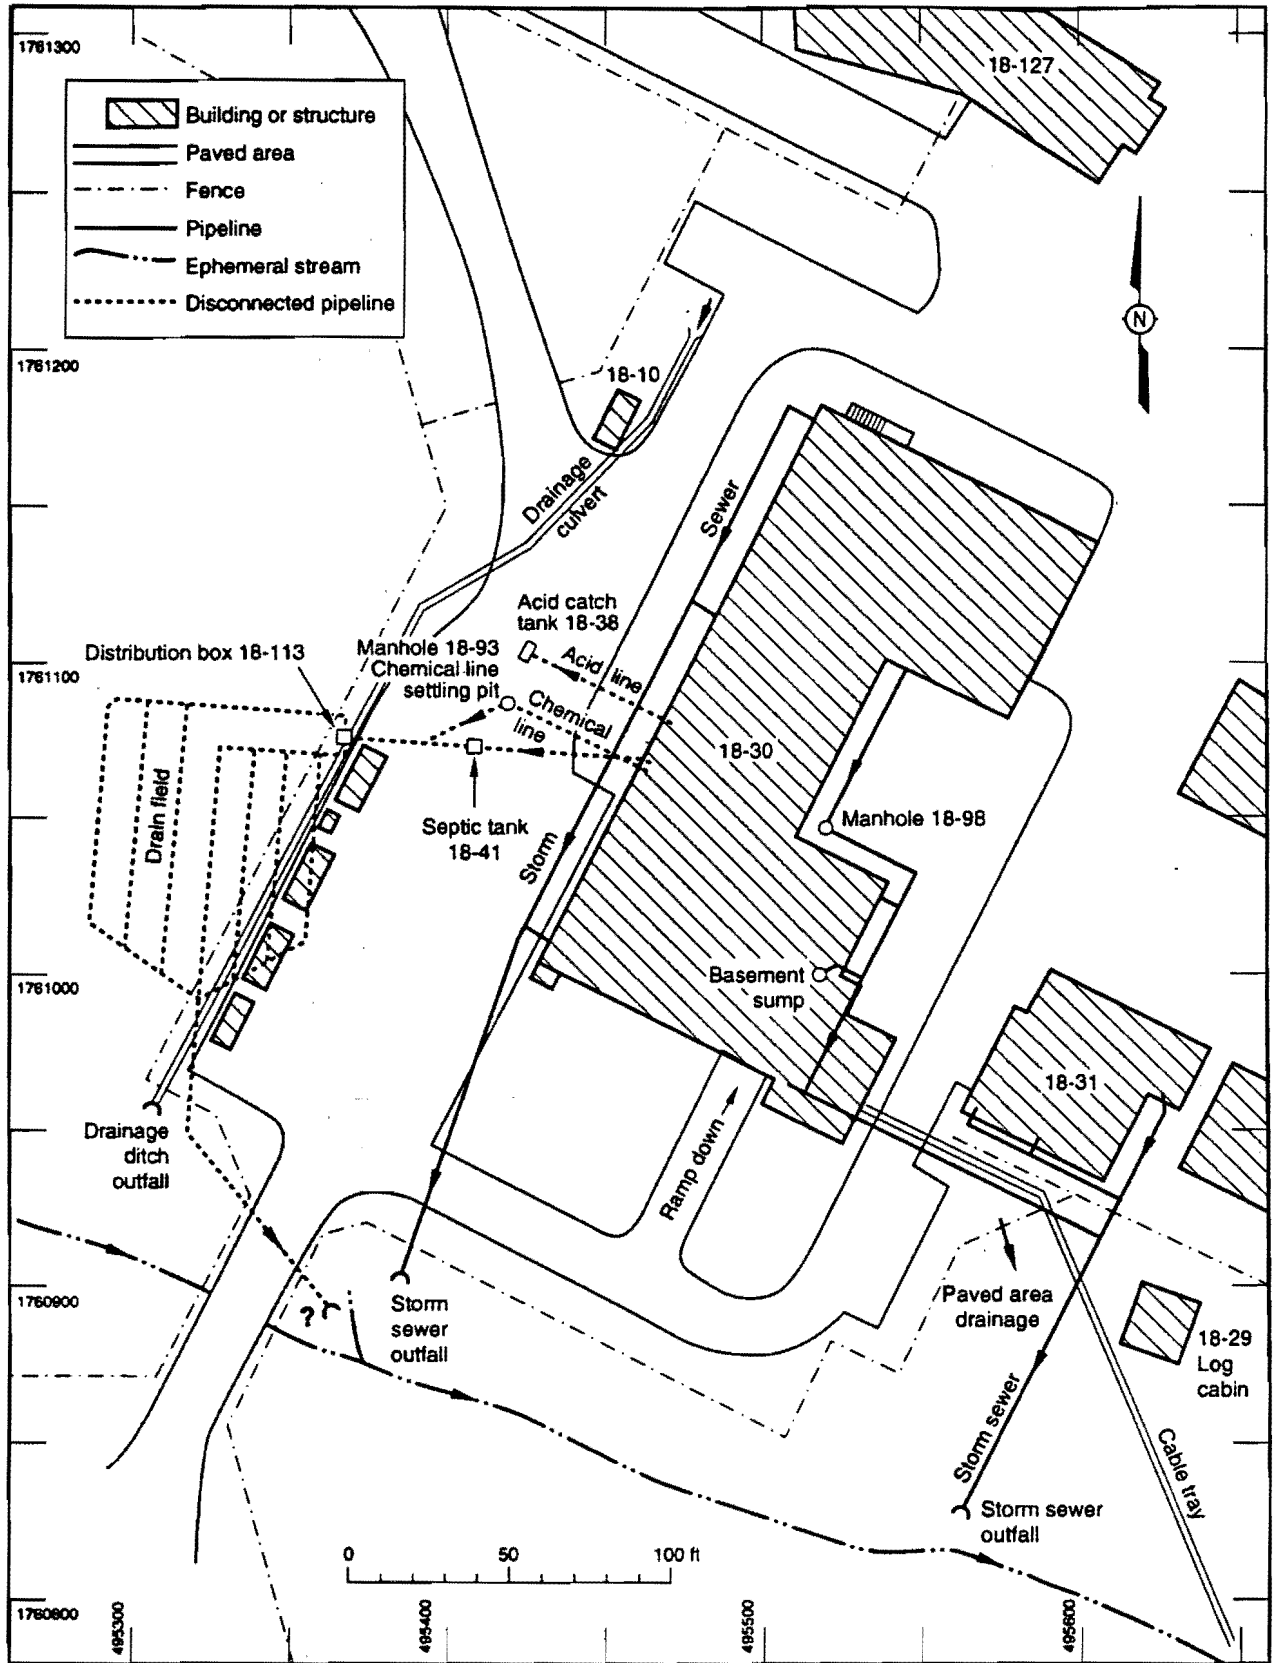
Structures and drain systems near Building 30, TA-18.
